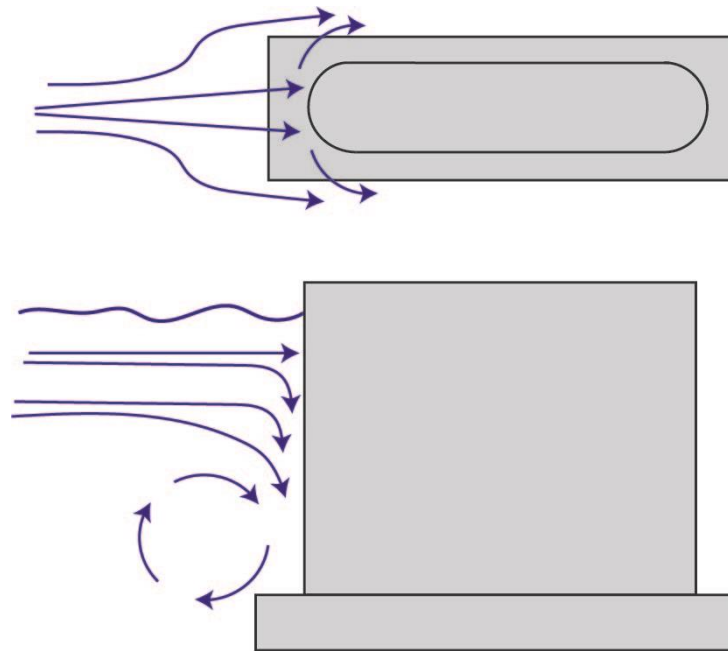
Local Scour at a Pier. Plan View (top) and Elevation View (bottom).
